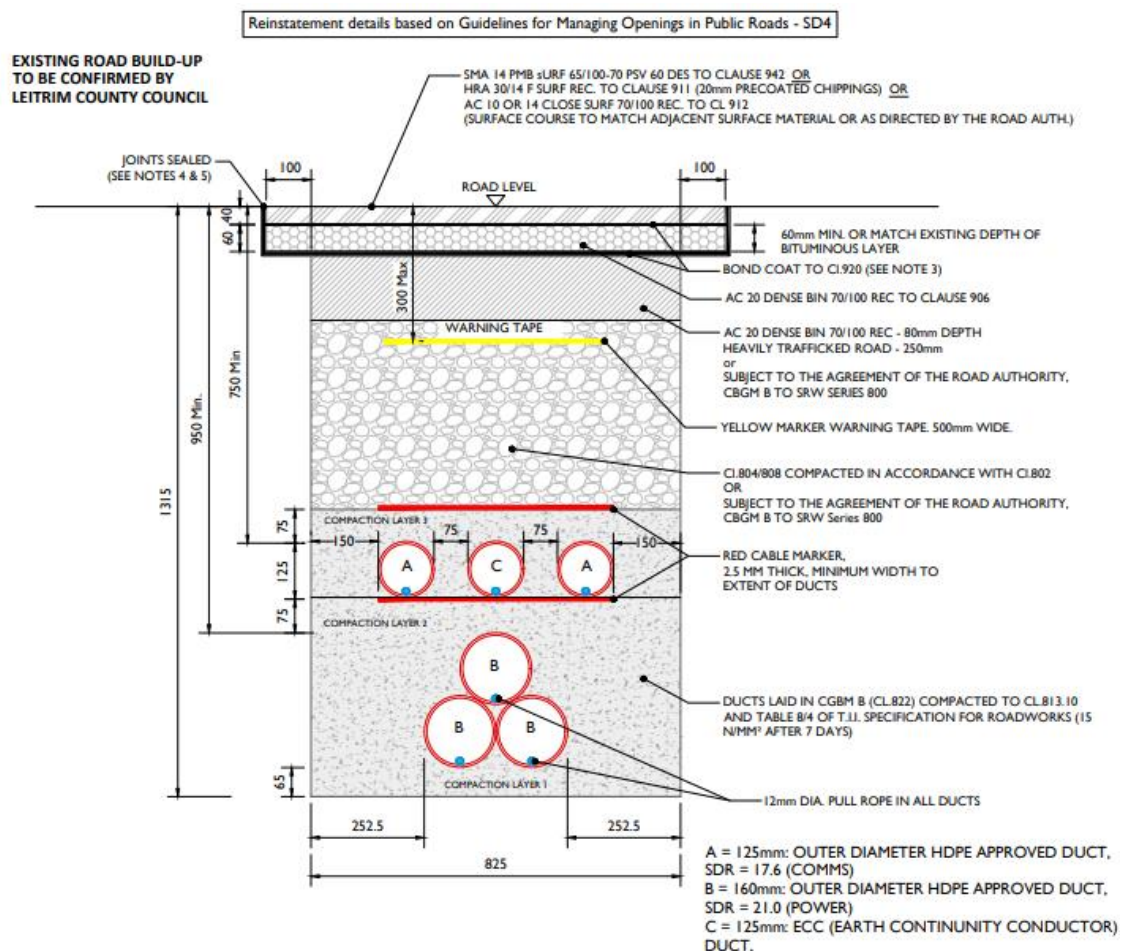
Typical 110kV Section Through Permanent Reinstatement of Longitudinal Opening in Roadway
